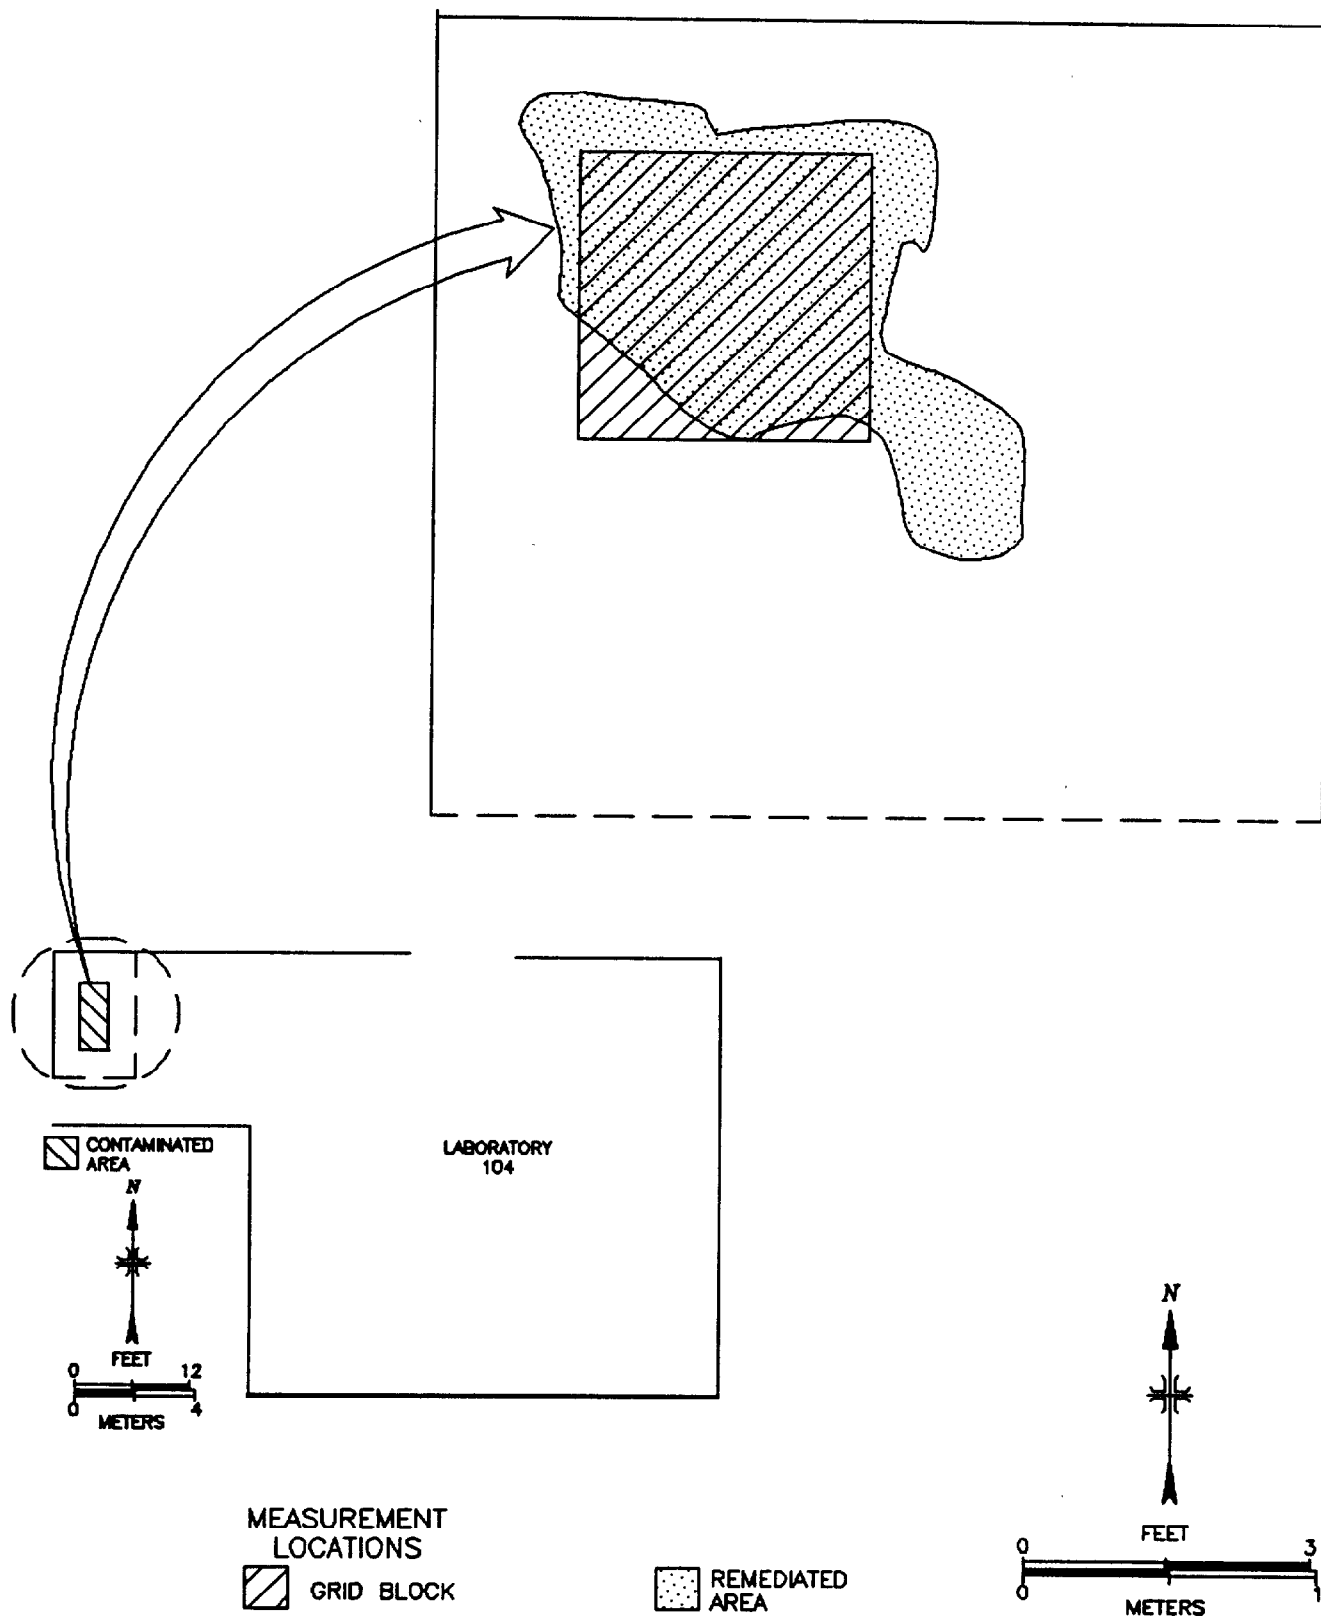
Building 24, Room 104 Northwest Corner of the Floor – Remediated Area and Measurement Locations
